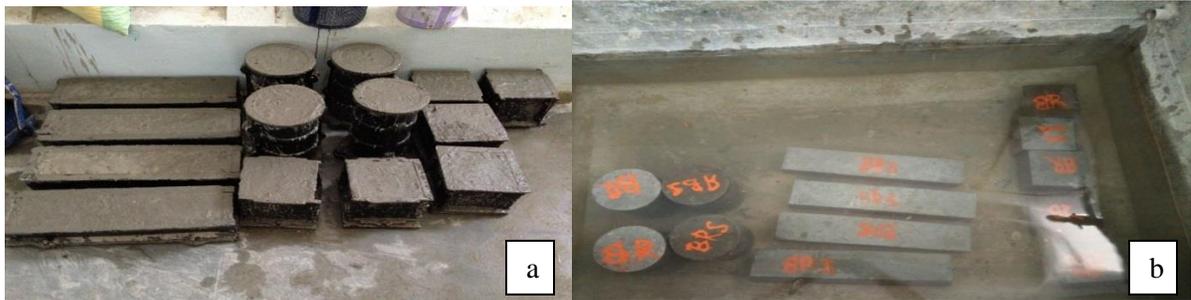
(a) Casted concrete moulds (b) Water curing of concrete samples.
